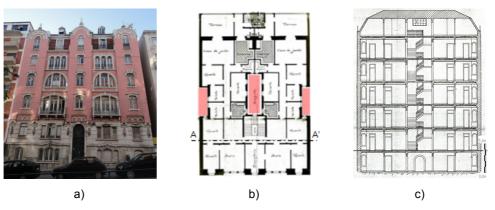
'Gaioleiro' building located on Duque de Loulé Avenue (Branco, 2007): a) Façade wall; b) Plan of a current floor; c) Cross section A-A'.
